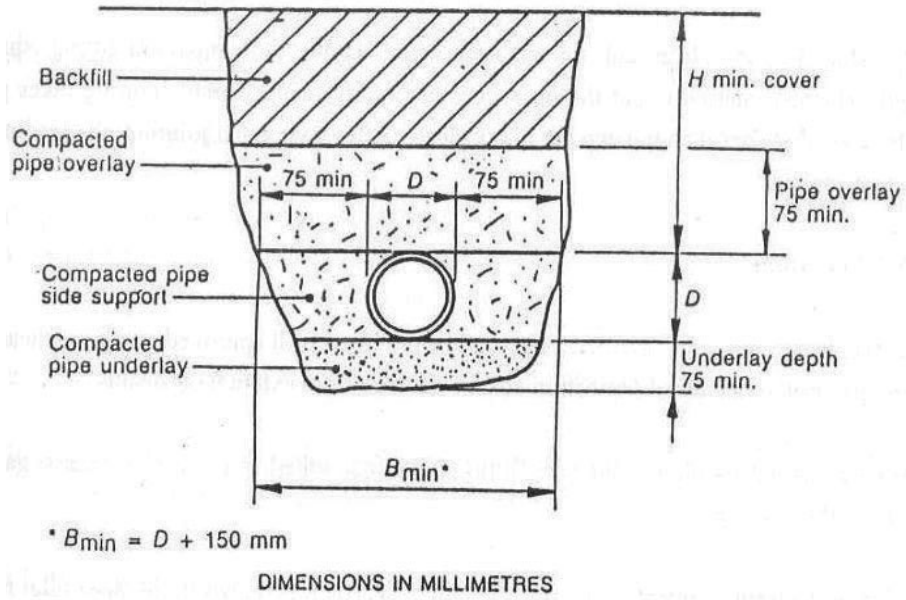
TYPICAL INSTALLATION IN A TRENCH
